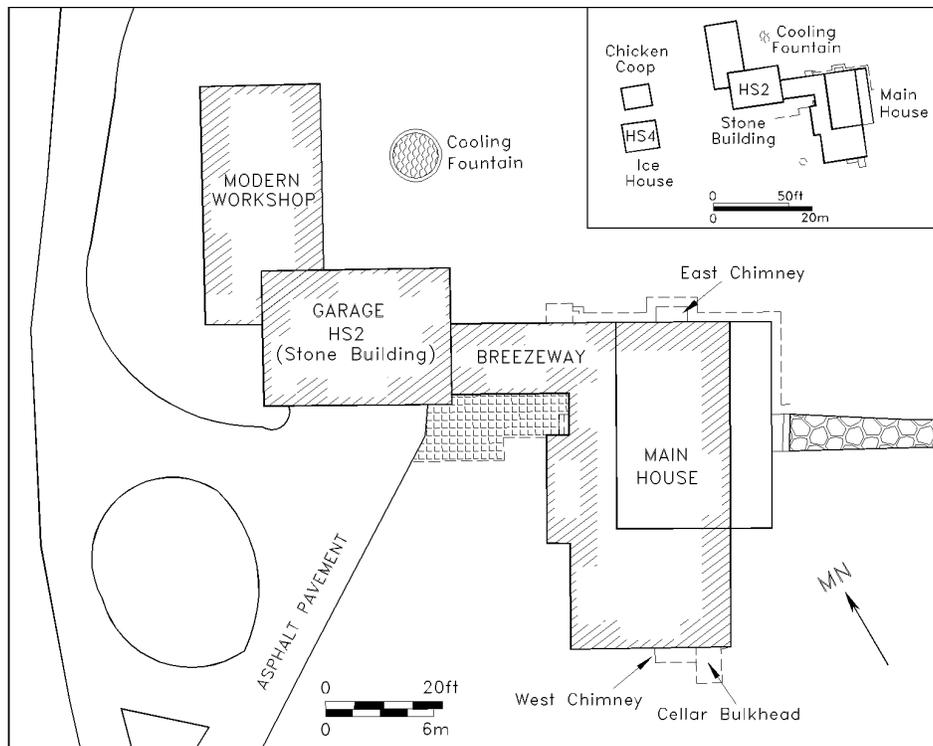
The main house in relation to HS-2, Summer Kitchen/Stone Building, and other structures.
